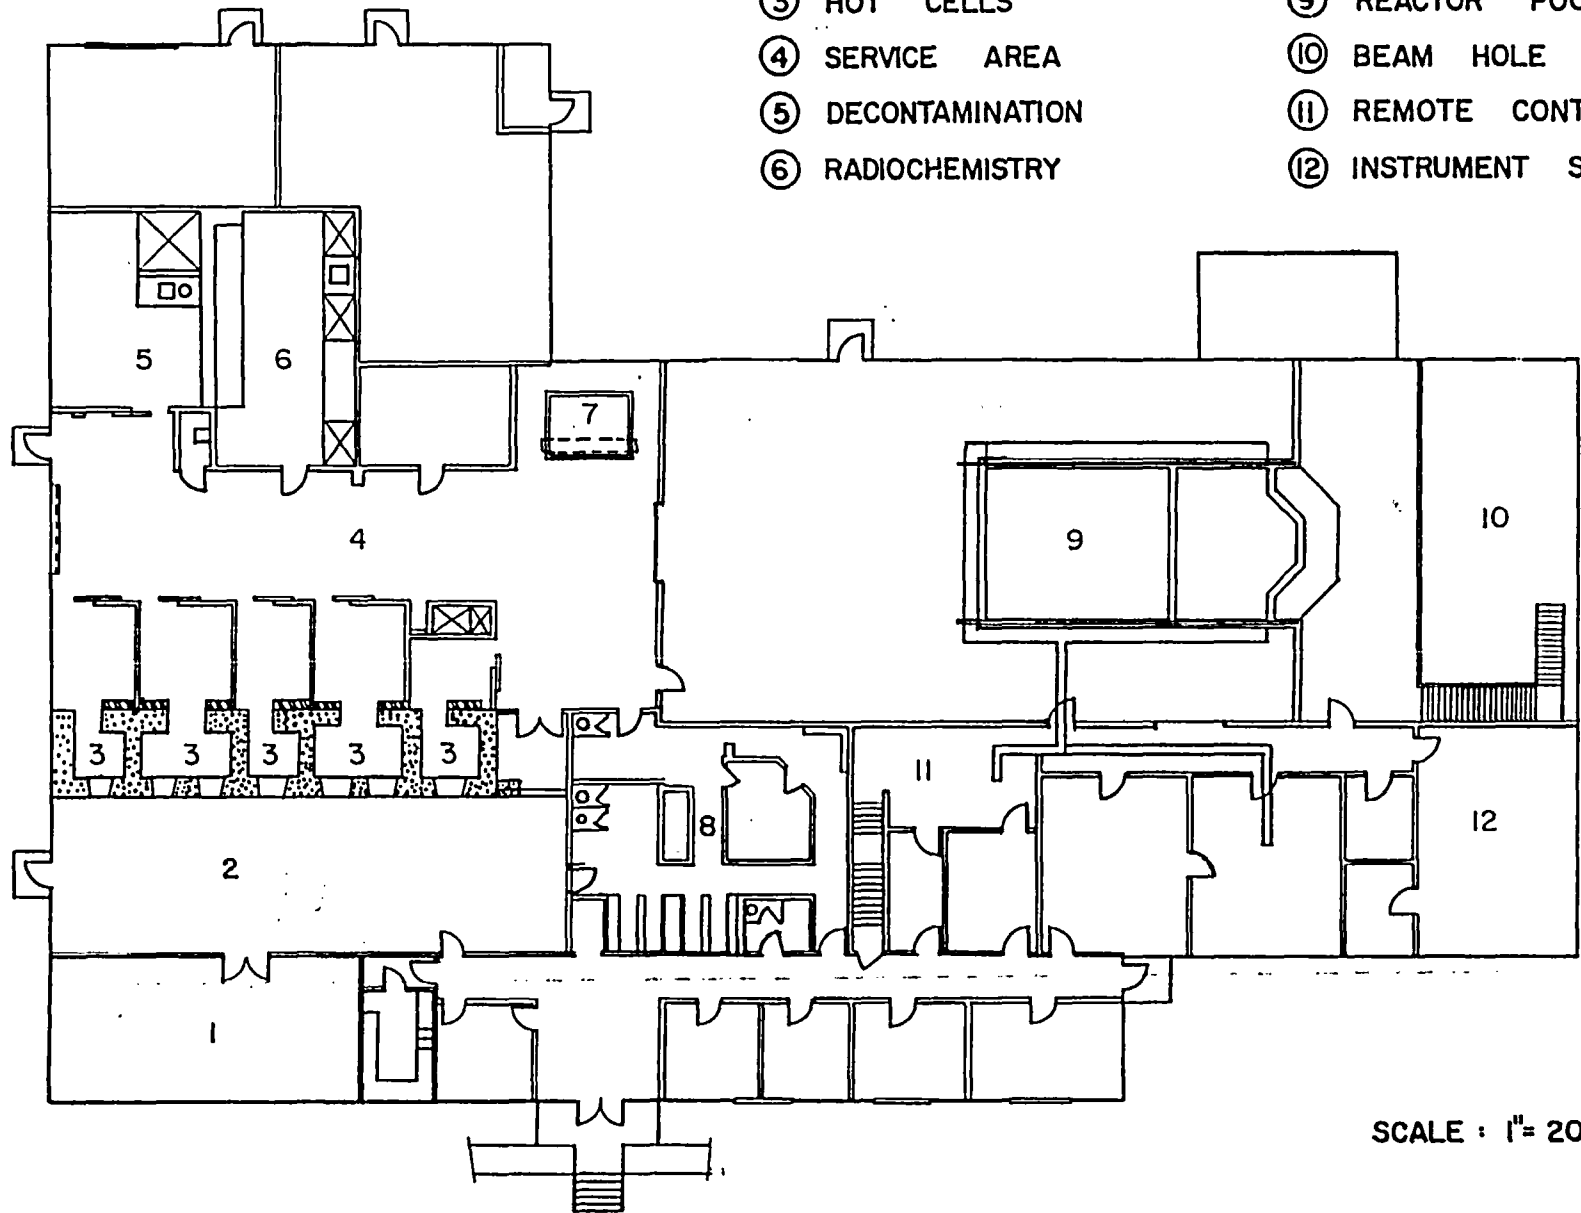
FLOOR PLAN OF REACTOR AND HOT LABORATORY BUILDING
